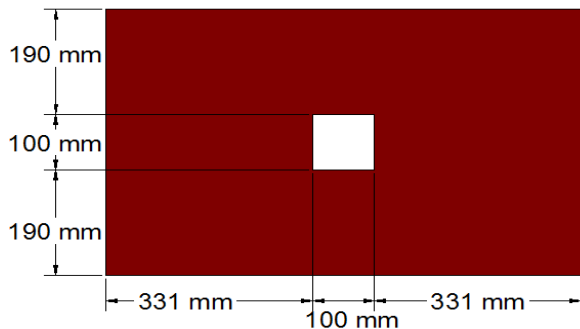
(a) Masonry wall with opening at the center of size 100×100
